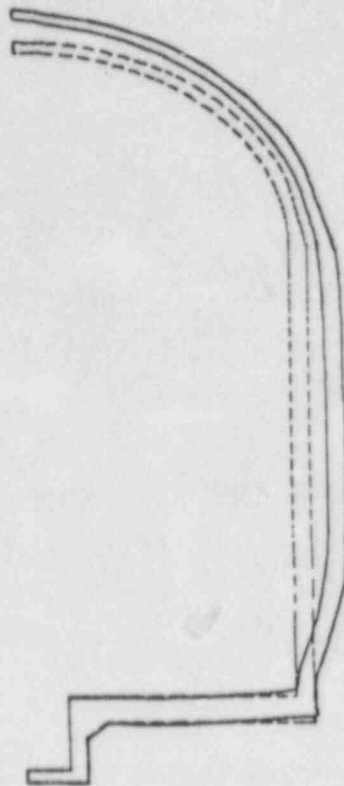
Undeformed and Deformed Shapes of the Indian Point Containment Building
